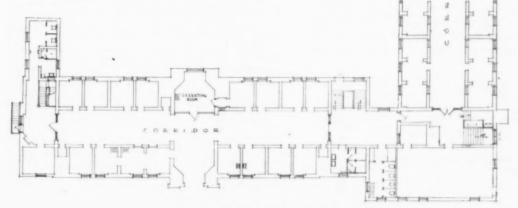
Venereal Hospital, Cleveland-First floor plan.
